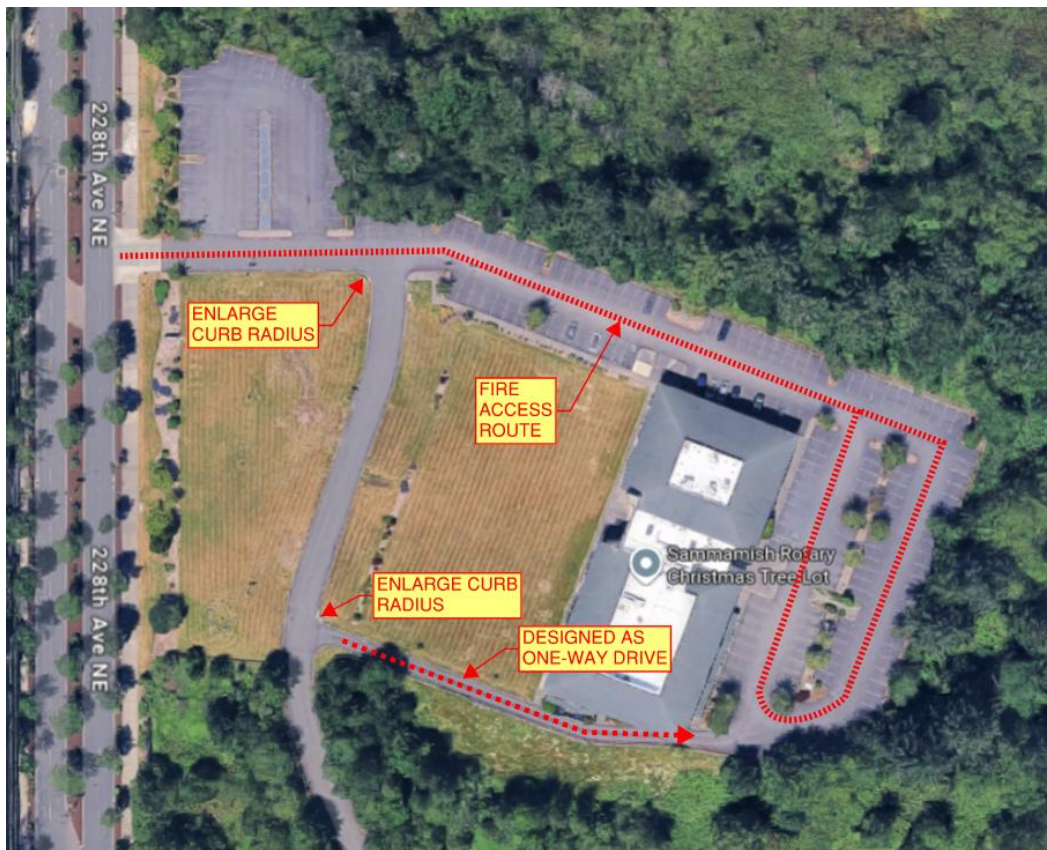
Site Hardscape and Recommended Improvements Locations (north is page up).
